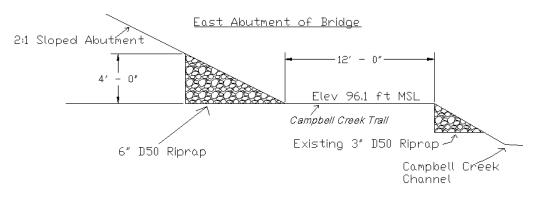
Typical Cross-Section of Bridge Riprap (East Side)
